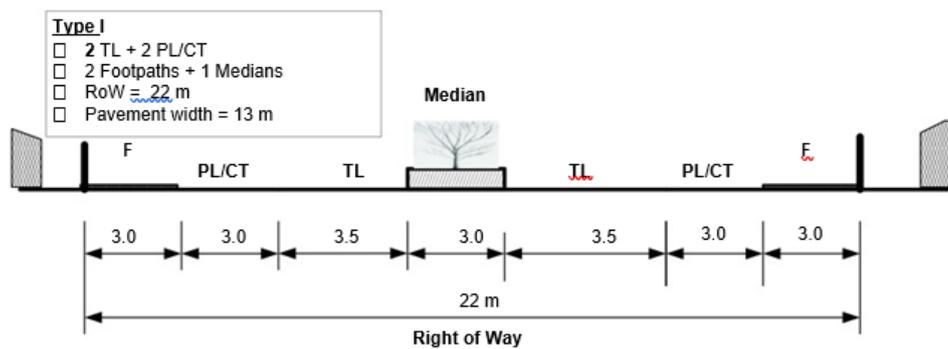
, Typical Cross-section for DCRN Roads (with RoW 22m)
